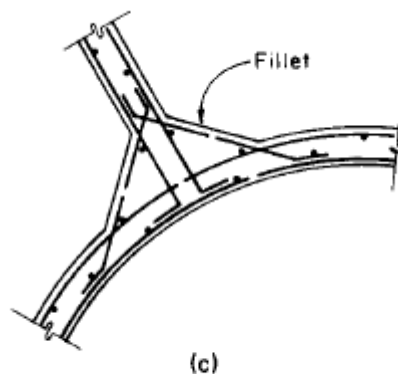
Typical reinforcement pattern at intersecting walls of circular silos.
